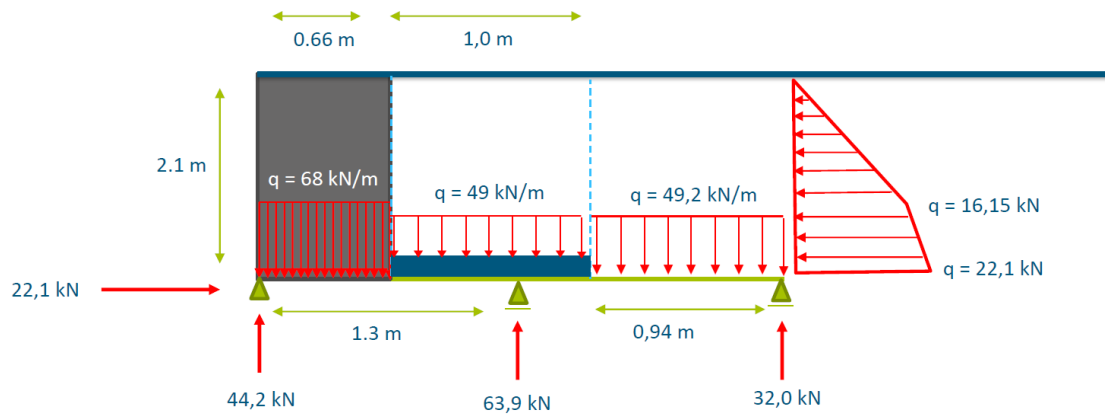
Pile support reactions after placing trench box, the new floor and the geobags.
